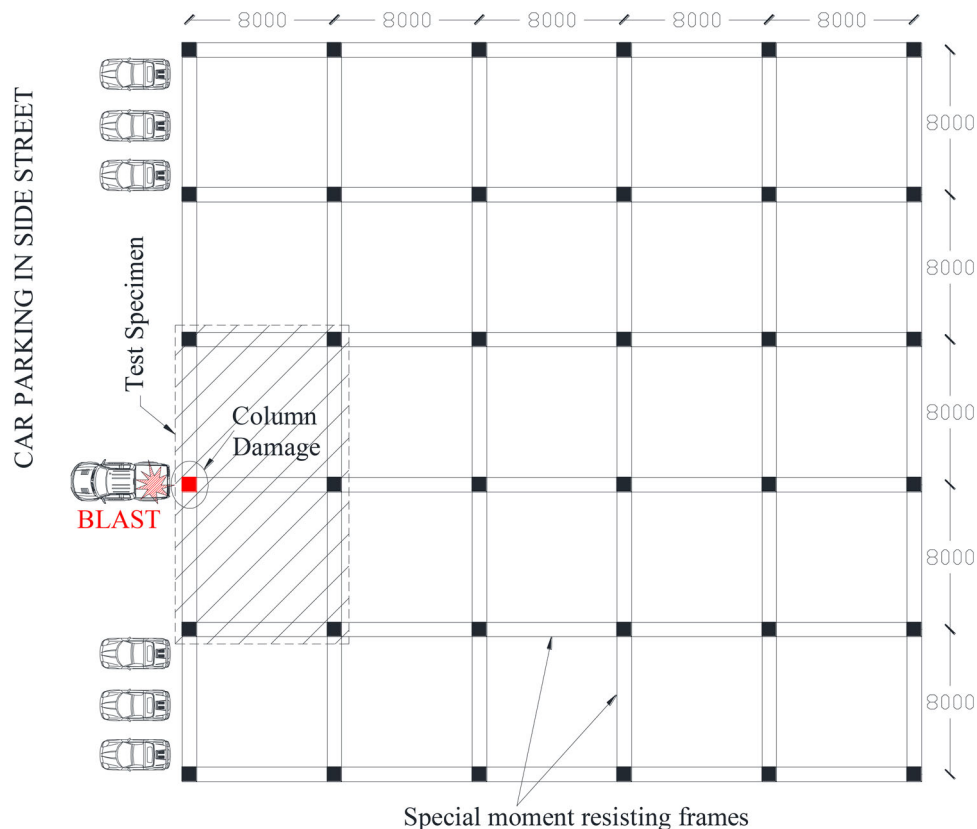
Layout plan of prototype RC framed building showing the damage of column of the test specimen extracted for testing (All dimensions are in mm).
